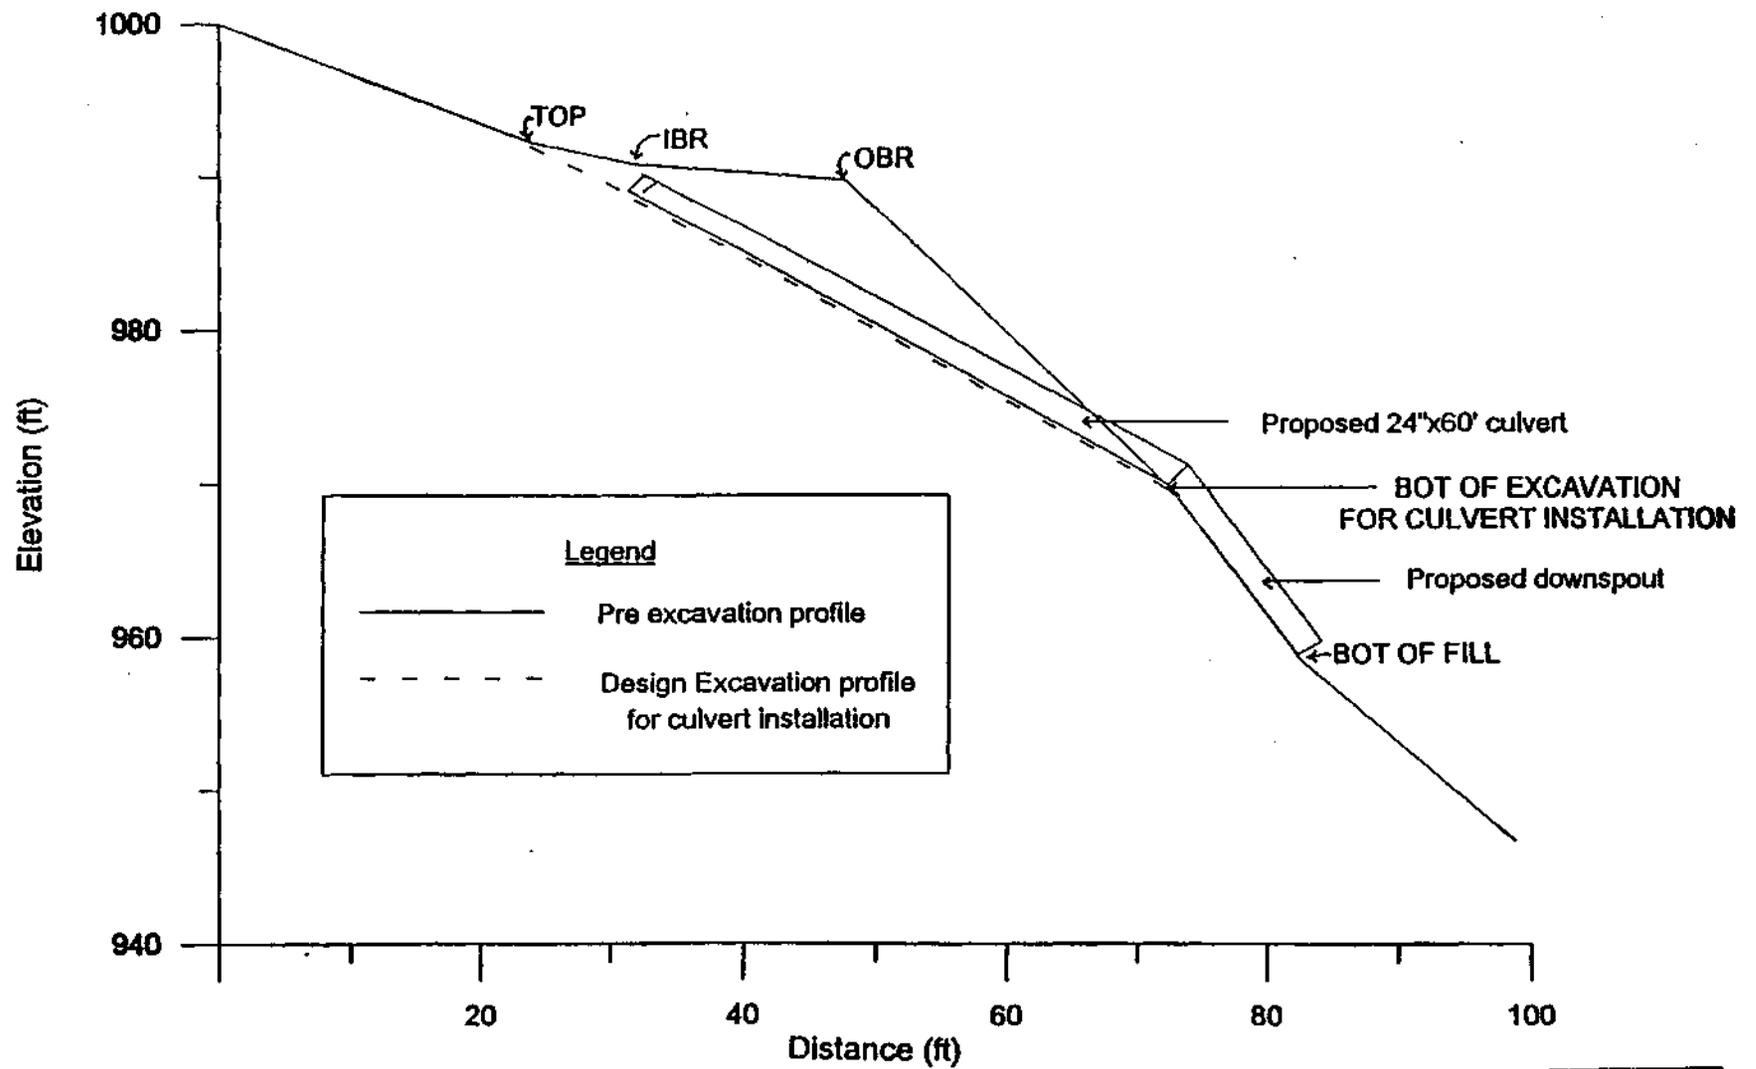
Butler Road: Site 8 Stream Crossing Pre & Design Excavation Profiles.
